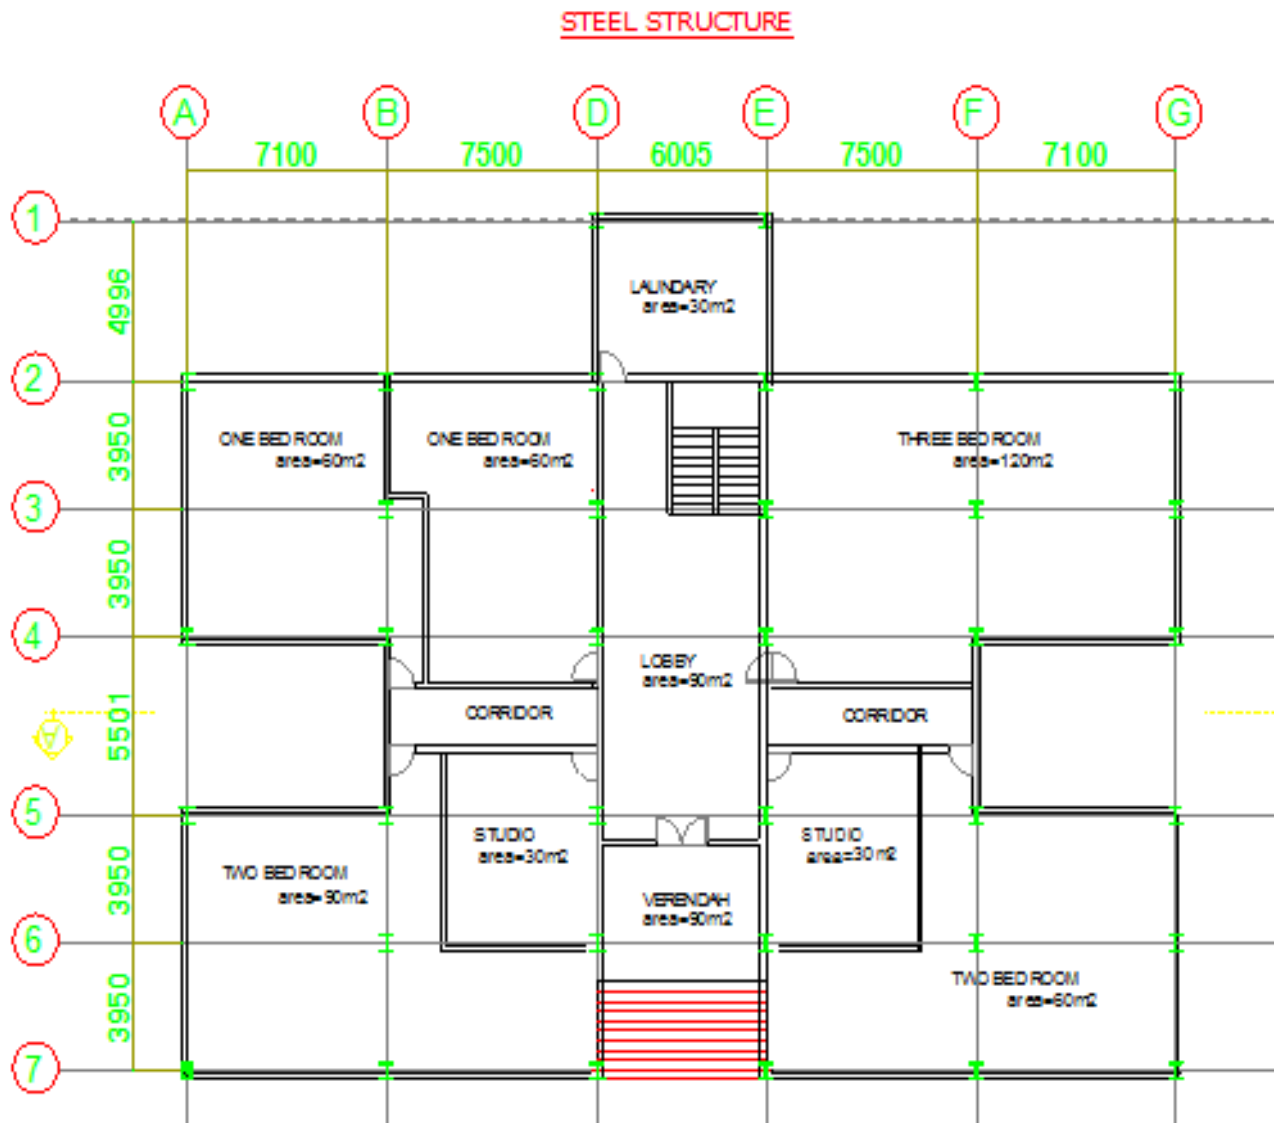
Typical ground to 4th floor plan steel scale 1:100
